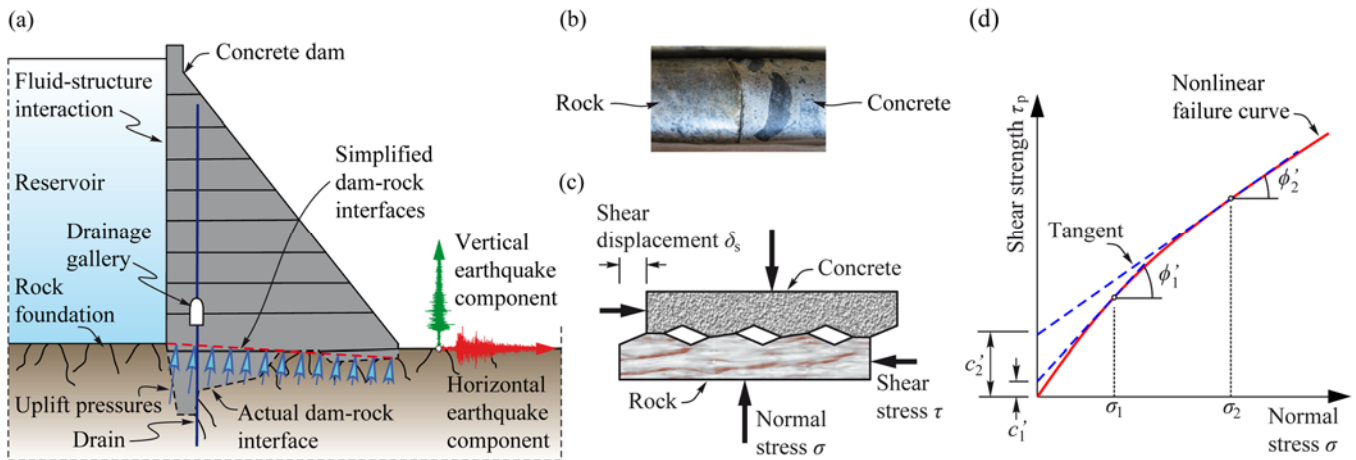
Unbonded rough concrete-rock interface: (a) located in a typical concrete gravity dam subjected to various loads, (b) drilled from an existing dam site, (c) shear tested, and (d) corresponding nonlinear shear strength.
